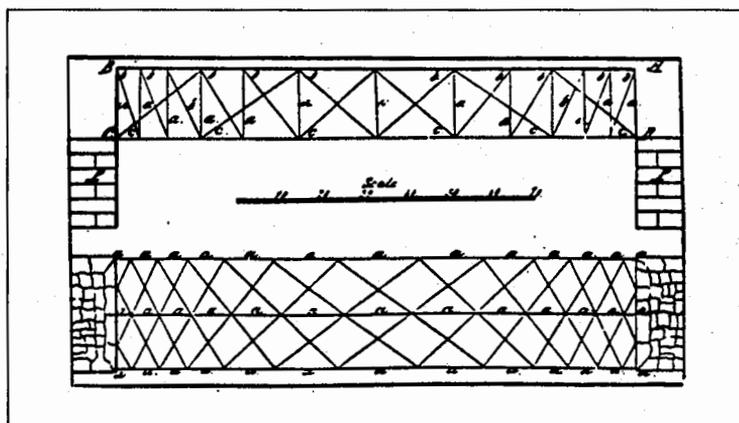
Long's truss bridge with equal loading in the diagonals.
